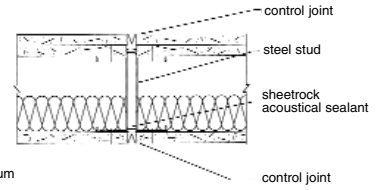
Control joints in the face of a drywall partition accommodate lateral expansion or contraction of up to 1/4 inch.
